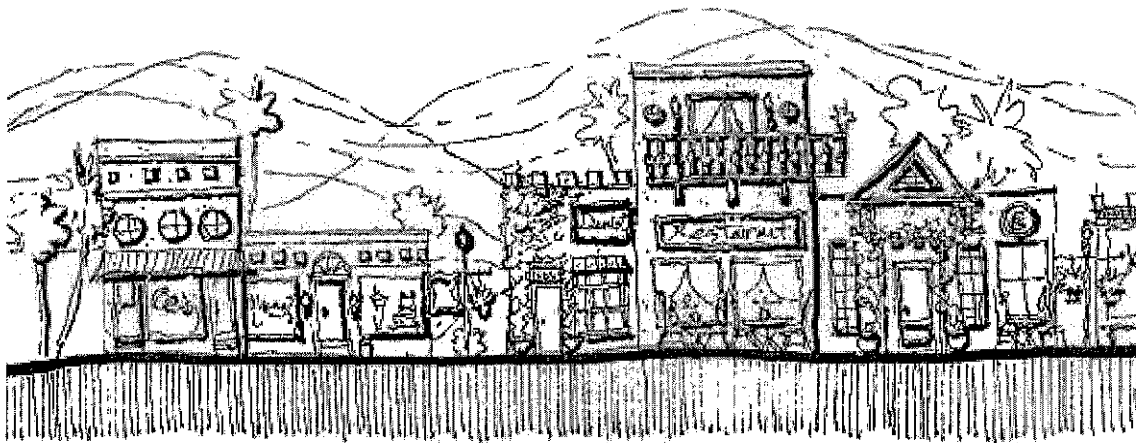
Application of the varied architectural elements that present a composite of Mediterranean streetscape and texture:
